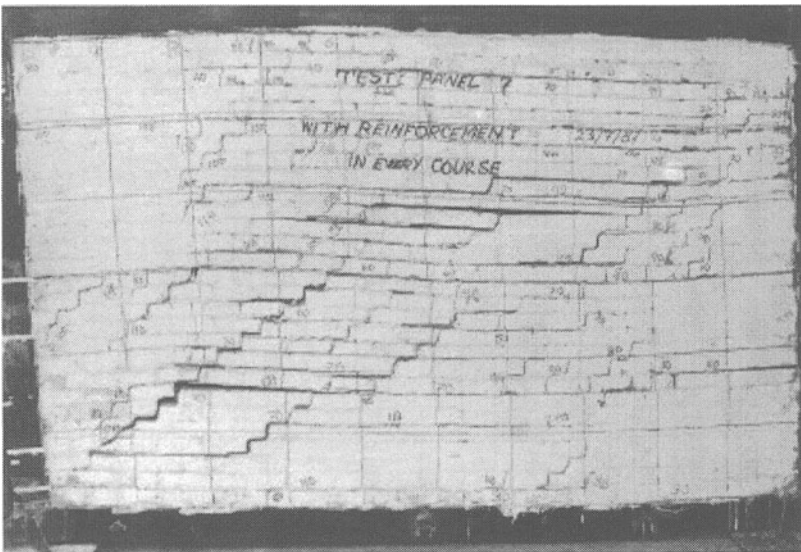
Steel frame with brickwork infill reinforced in every joint
